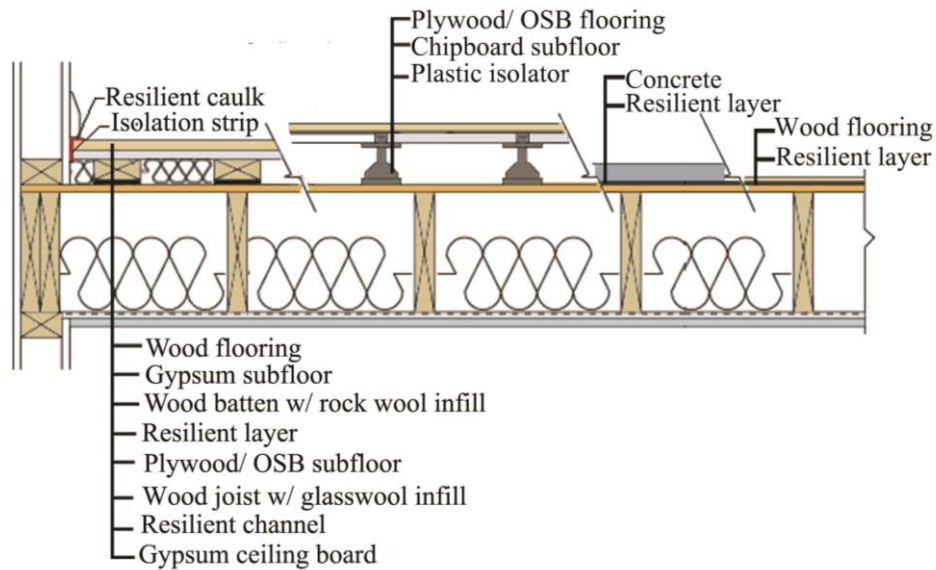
Various details of the floating floors designed for the timber frame floor
